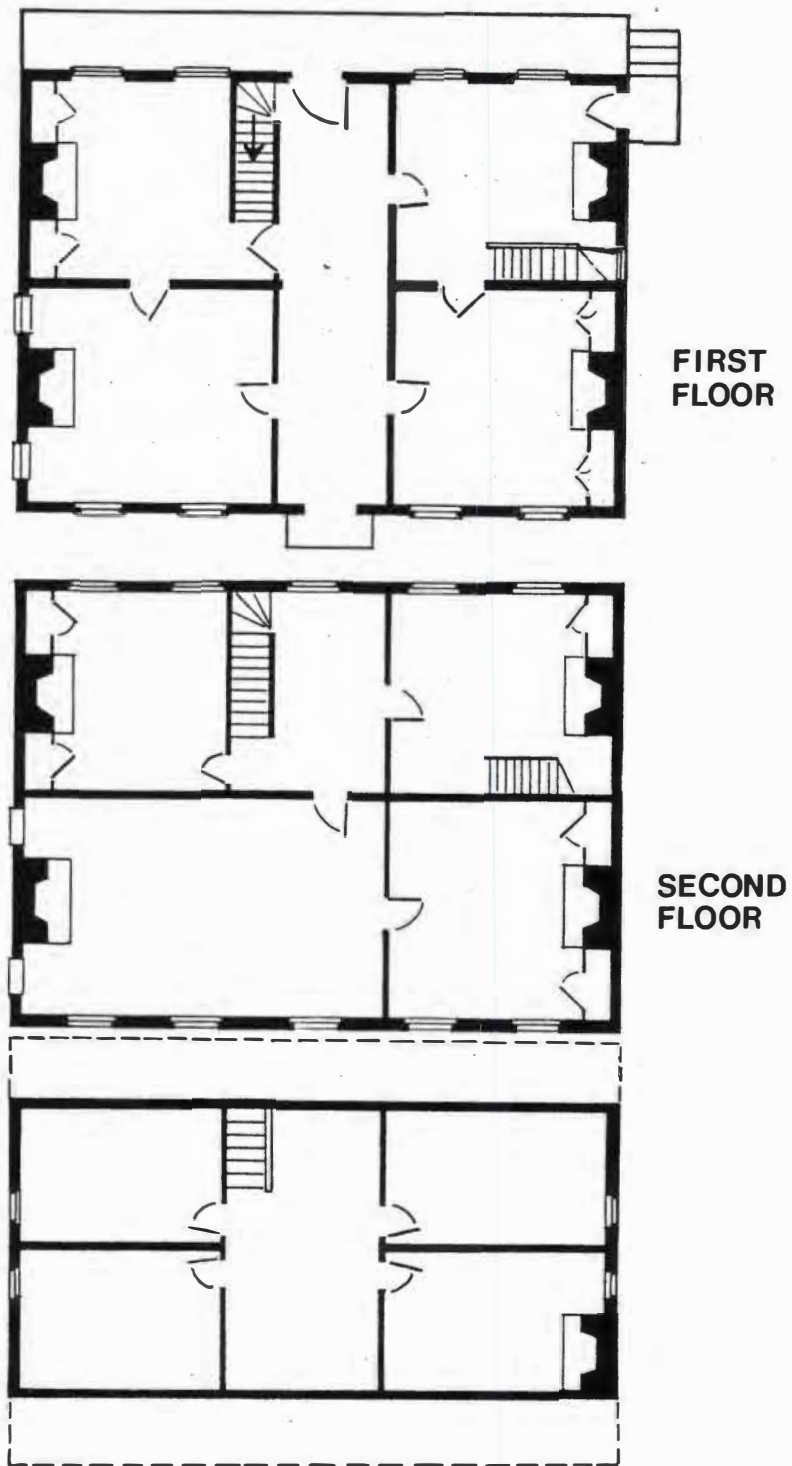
Floor Plan of Locust Grove Mansion House (after Huff et al. 1988:14).
